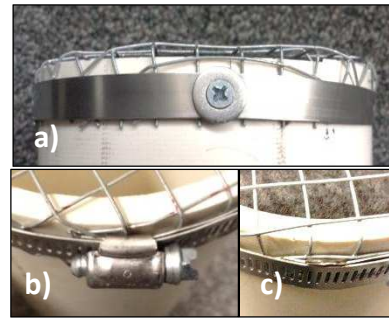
a) Hose clamp and screw fasten grate to pipe b) hose clamp tightener c) hose clamp tightener removed
